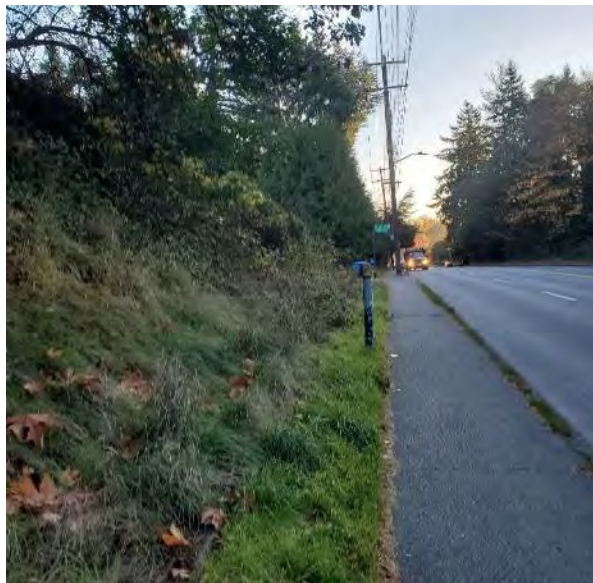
Overview of proposed retaining wall location east of 10th Avenue NE,
